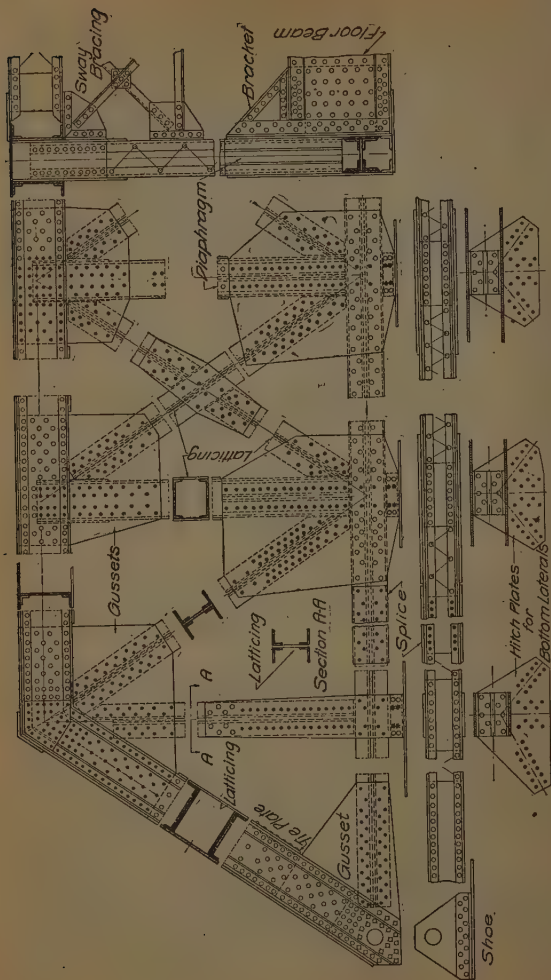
Partial Detail Drawing of a Thru Riveted Railroad Bridge
